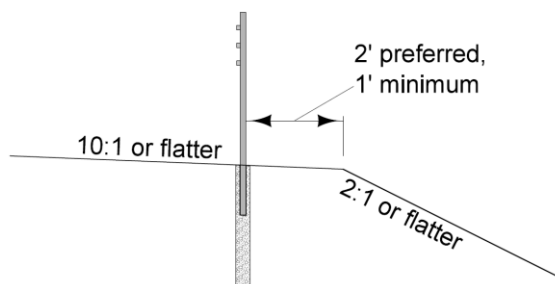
High tension cable guardrail placed adjacent to steep slopes.
